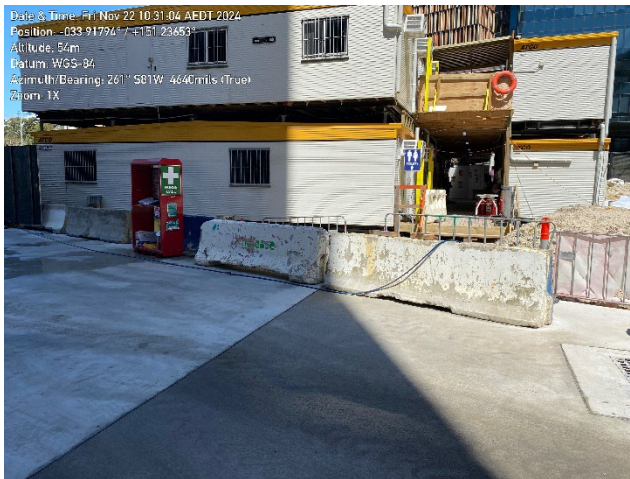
Nurse call station at new site access Gate A. Sealed driveway with truck washdown hose.
